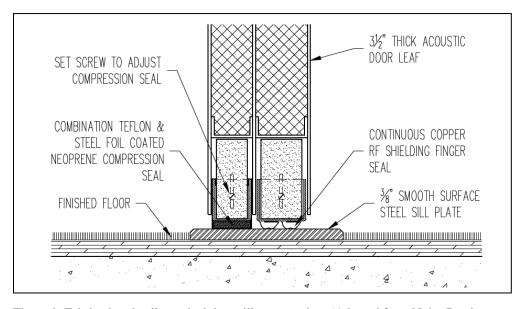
Fabrication details: typical door sill construction. (Adapted from Noise Barriers, LLC, 2011.)
